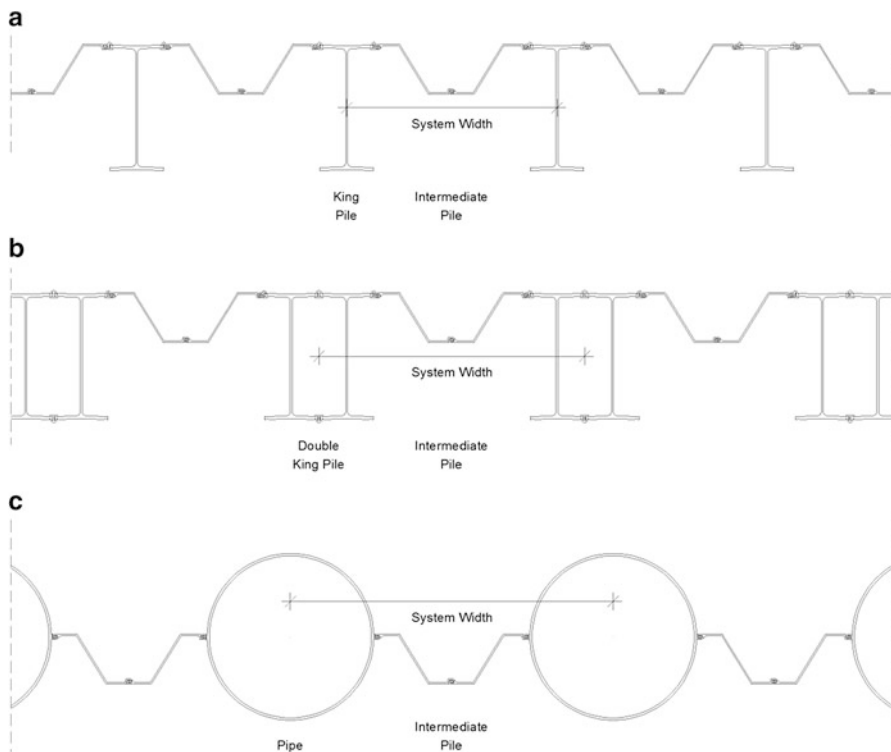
Cross section of different types of combined sheet piles walls (plan view). (a) Single King Piles. (b) Double King Piles. (c) Pipes
